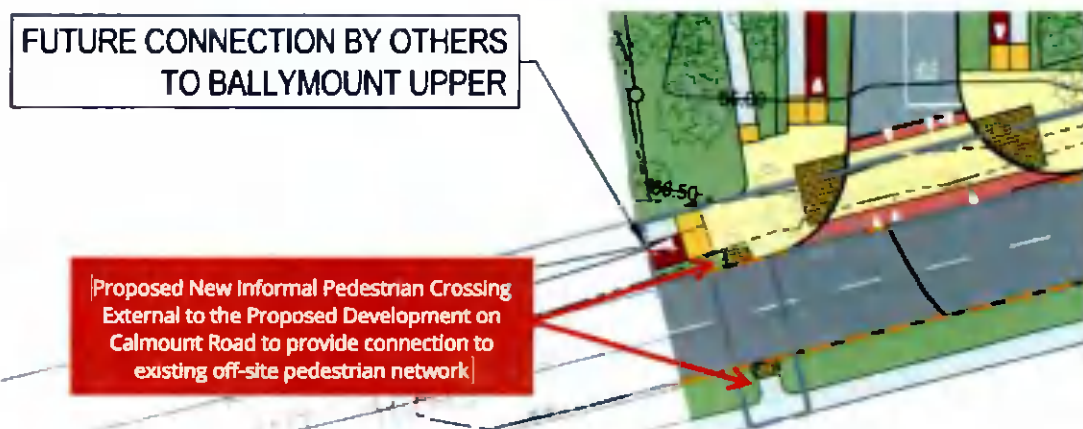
Proposed External Pedestrian Crossing Position On Calmount Road
